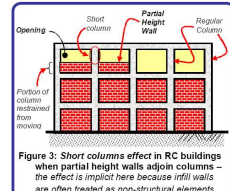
Short column effect in RC buildings when partial height walls adjoin columns – the effect is implicit here because infill walls are often treated as non-structural elements.
